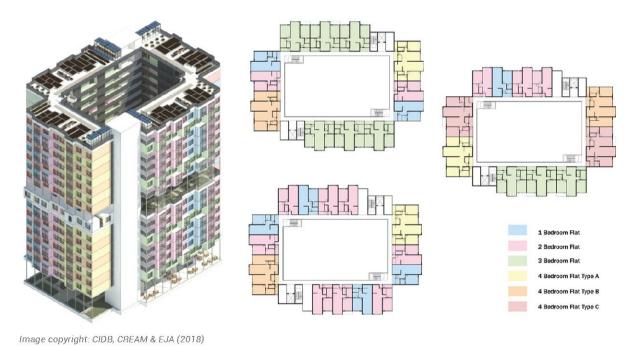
Example of the Building Planning Stage (Flat Block Plan)
